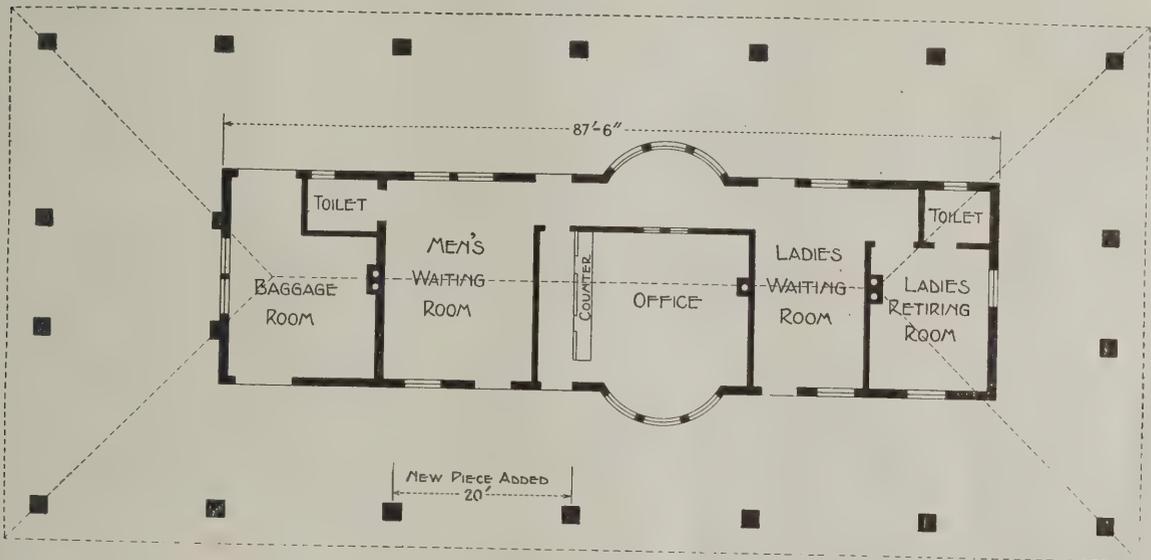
Ground Plan of Railroad Station After It Had Been Remodeled—Scale 3/64 in. to the foot
